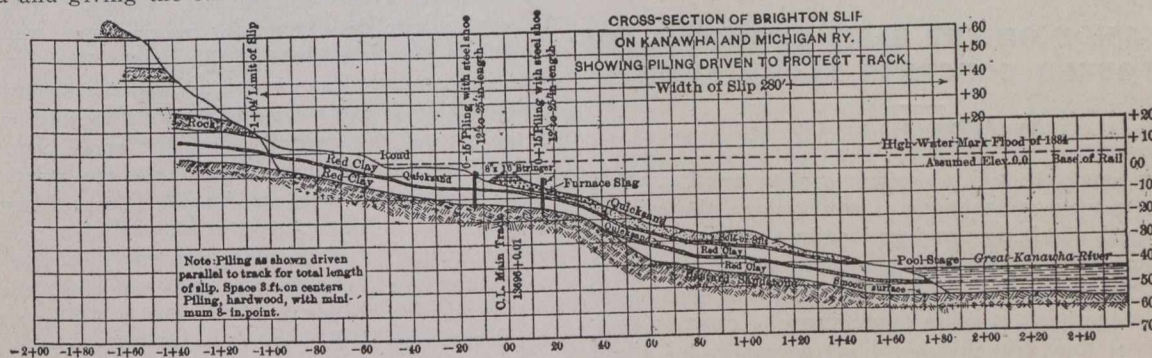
Cross Section of Brighton Slip Showing Piling Driven to Protect Track.
